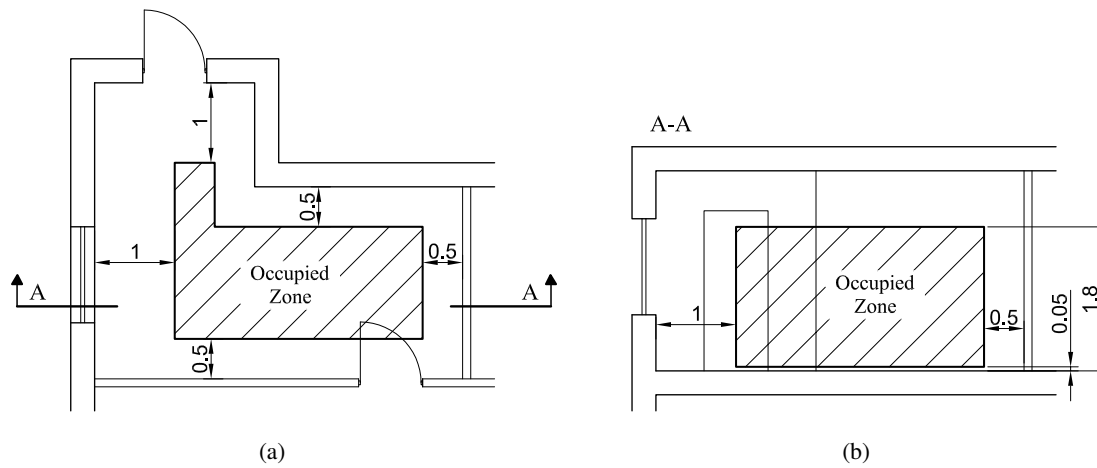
Default distances defining occupied zone in an exemplary room for a non-residential building presented on a) plane and b) cross-section. On the basis of EN 13779 [2007].
